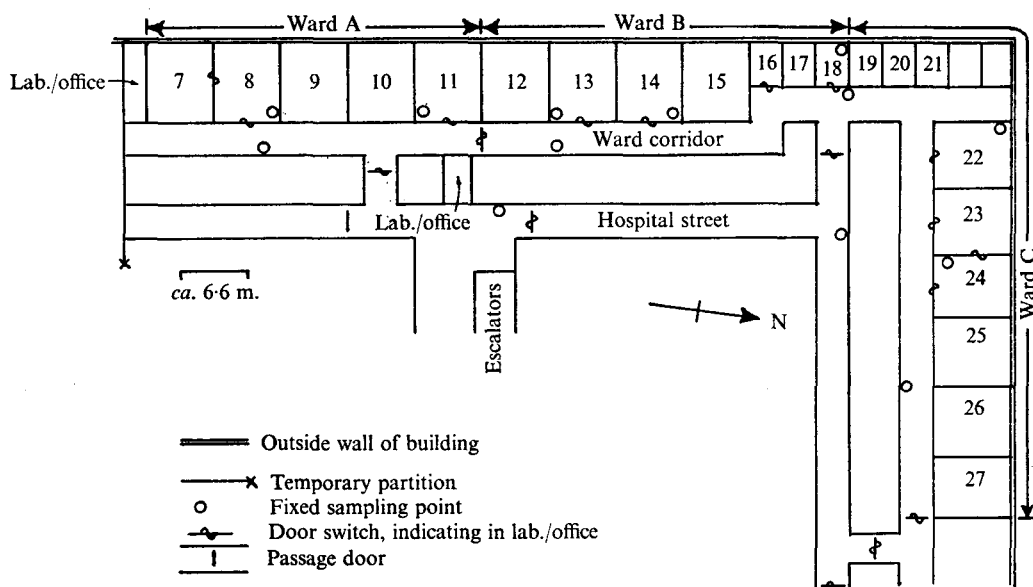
Plan of part of the medical ward floor showing location of the fixed sampling points and the indicating and recording switches attached to certain doors. Rooms 7-11, 12-15, 22-27 had six beds each, rooms 16-21 were single bed rooms.
